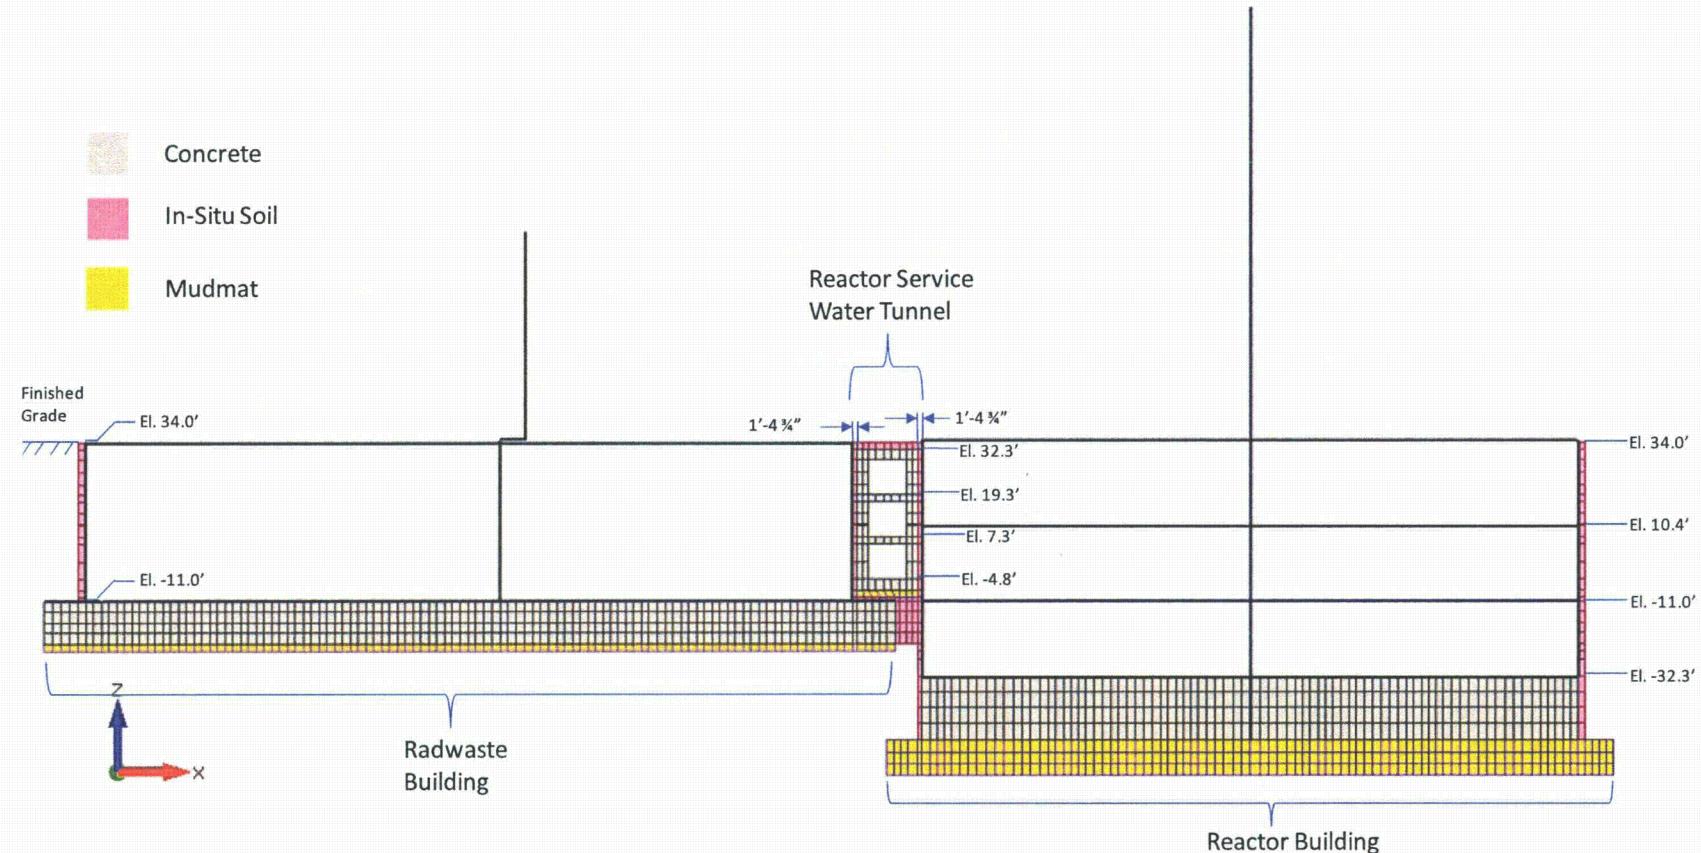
H.6-210: SSSI 2D Model of RB + RSW Piping Tunnel + RWB
